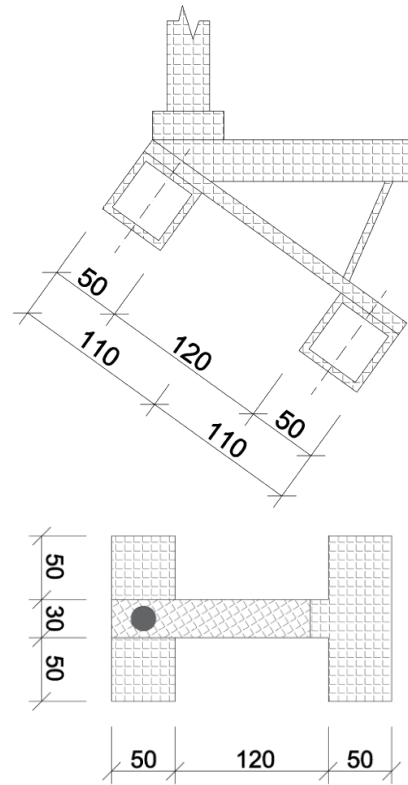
Steel load distributing instrument (dimensions in mm) and it's contact area.
